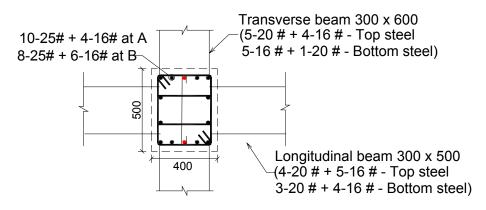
Reinforcement details of longitudinal and transverse beam
